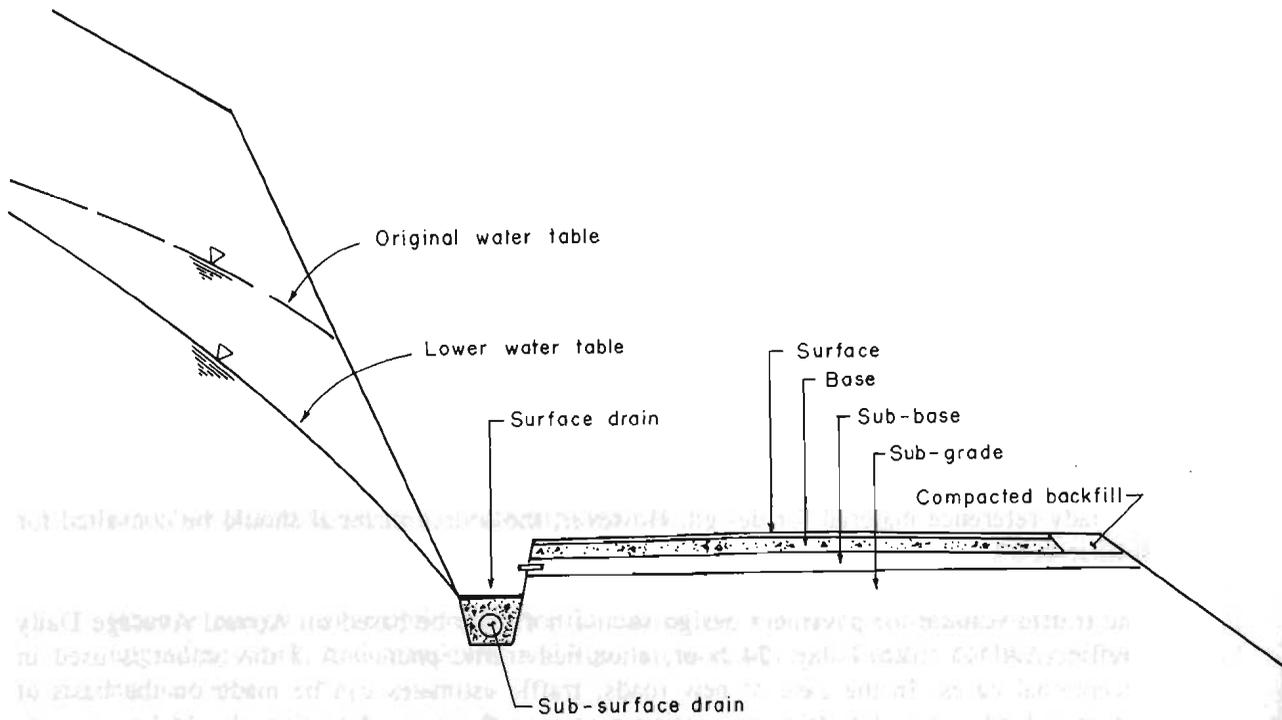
Sub-surface drain to protect pavement in wet areas in soils
